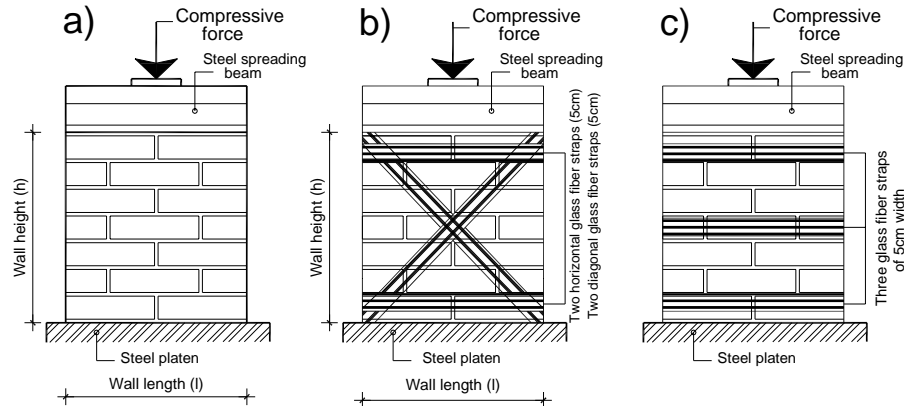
Shape and types of masonry wall specimens for compressive load testing.
